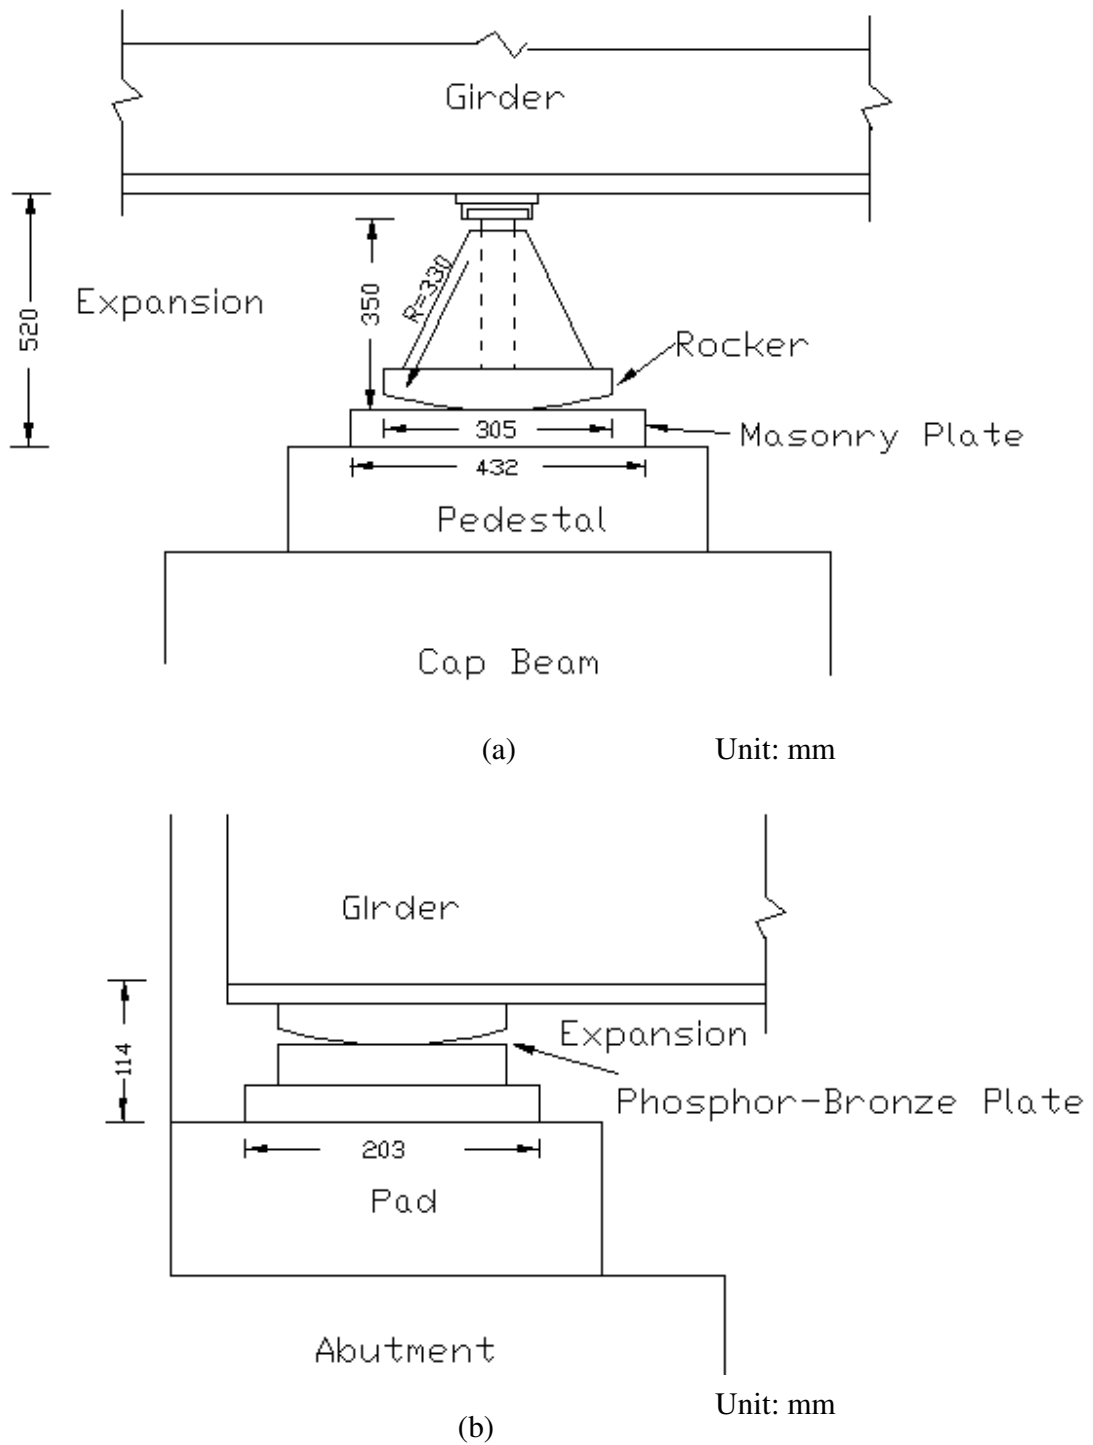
Expansion Bearings in Multi-Span Continuous Steel Bridge; (a) High Type Expansion Bearing; (b) Low Type Sliding Bearing
